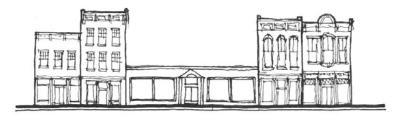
Undesirable infill building is too short and not in scale with neighbors.
